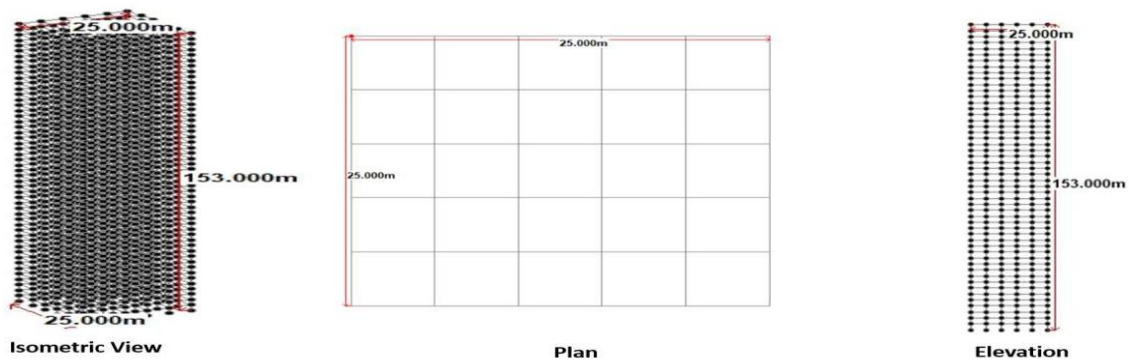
(G+5), (G+20), (G+50) Models Isometric View, Plan and Elevation
